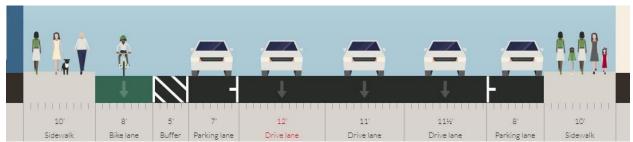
Folsom Street section view between 5th Street and 4th Street, midblock, looking west
